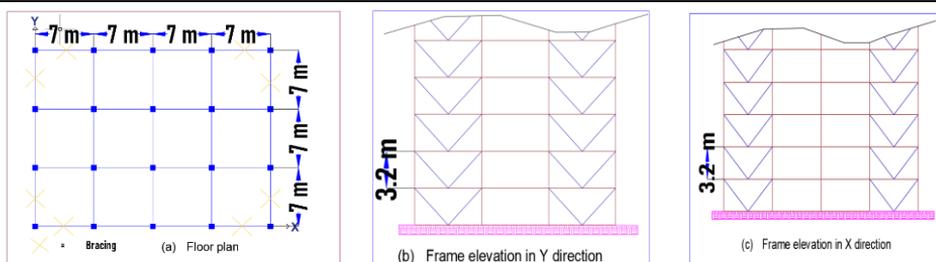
Floor plan and elevation view in dual systems under study (all units are in meter (m))
